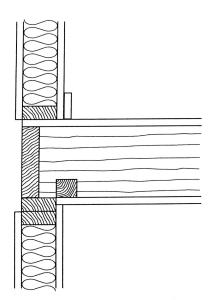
Wall-floor joint in typical platform frame construction, Sunley et al (1985).
